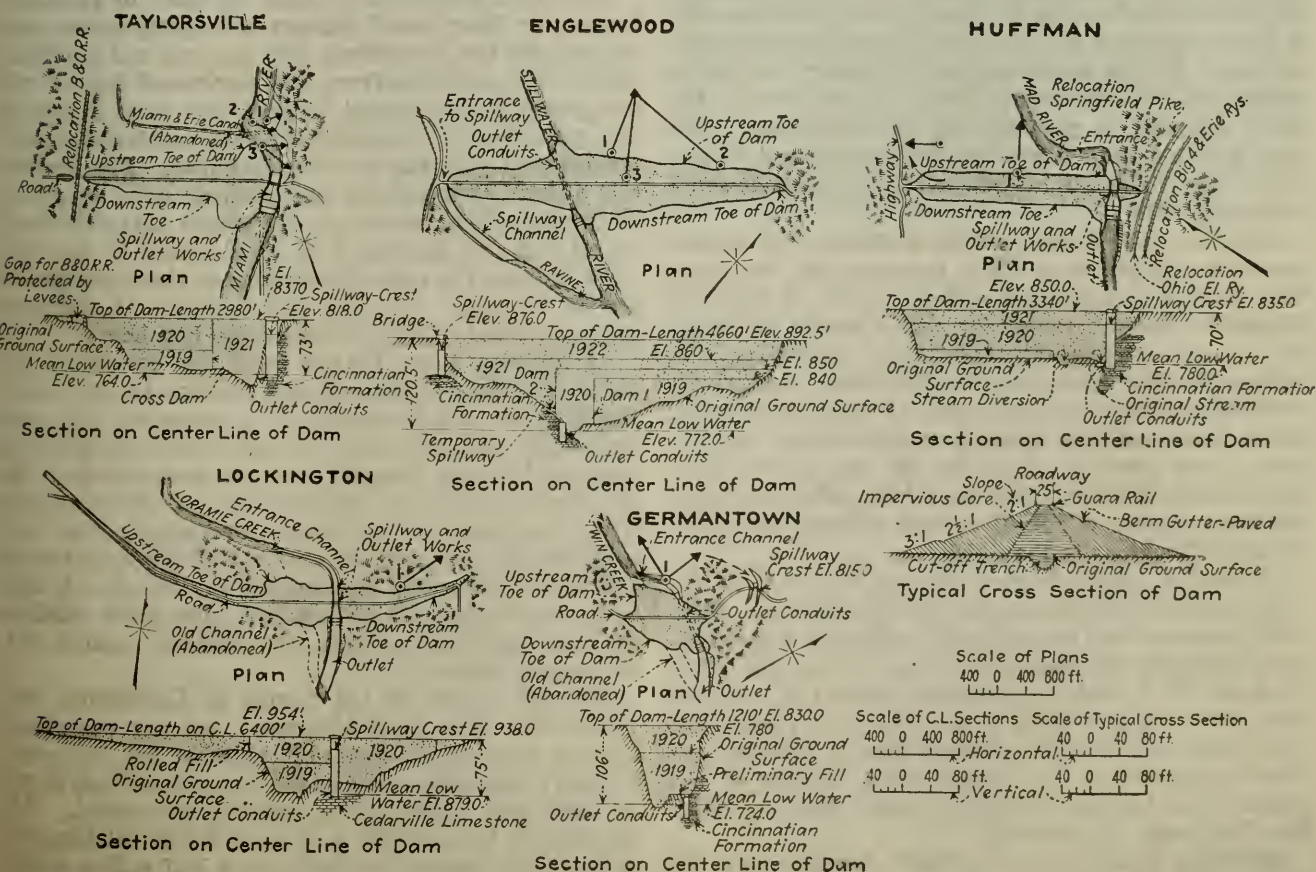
PLANS AND SECTIONS OF DAMS SHOWING SEQUENCE OF FILL AND PUMPING PLANT LOCATIONS
